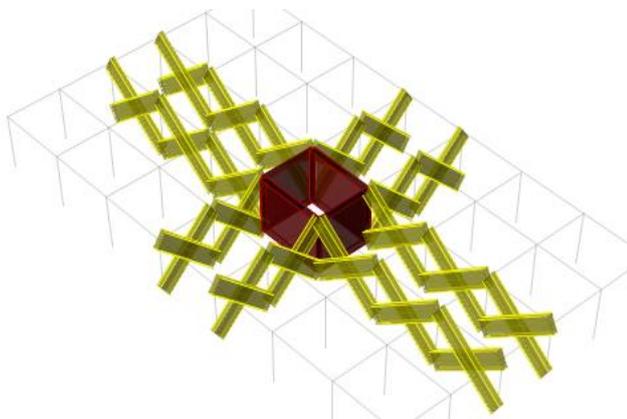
3D VIEW OF BUILDING MODEL 1(WITHOUT OUTRIGGER)
